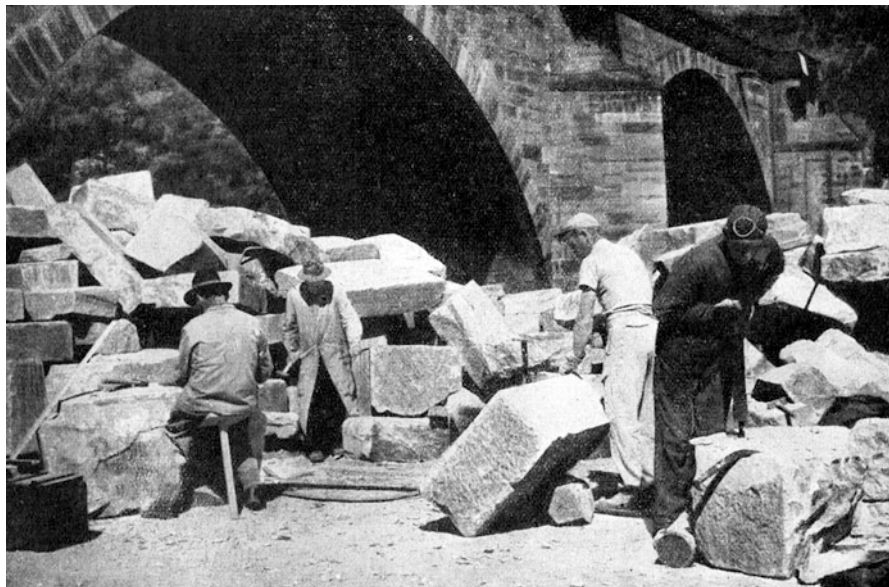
Heidelberg, stone masons at their workshop, established right on the construction site, next to the Old Bridge. *Source:* Steinbach 1948, 40
